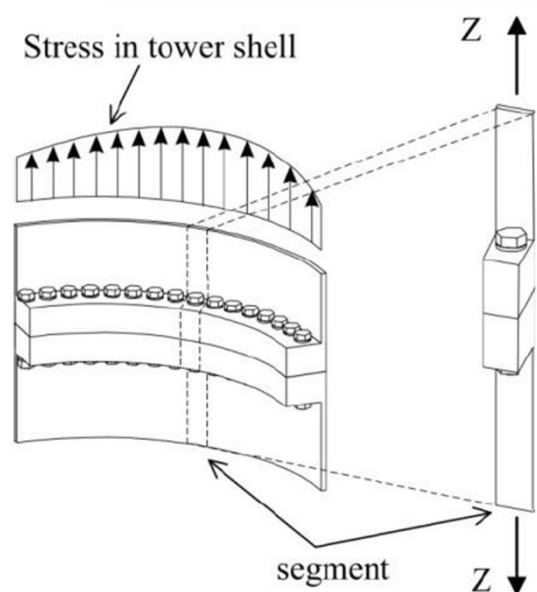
Most common joint configuration used in non-adhesive form locked technology
